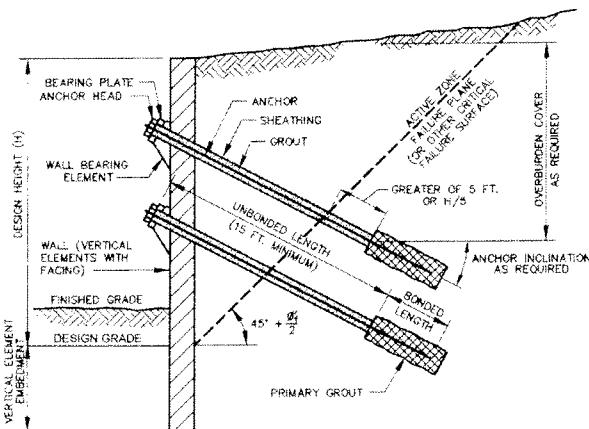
Anchored Wall Nomenclature and Anchor Embedment Guidelines.
